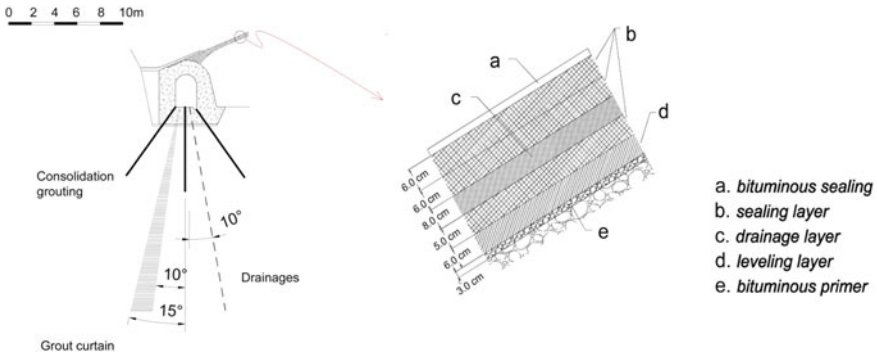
Menta Dam—cross section of the perimeter tunnel and bituminous facing
